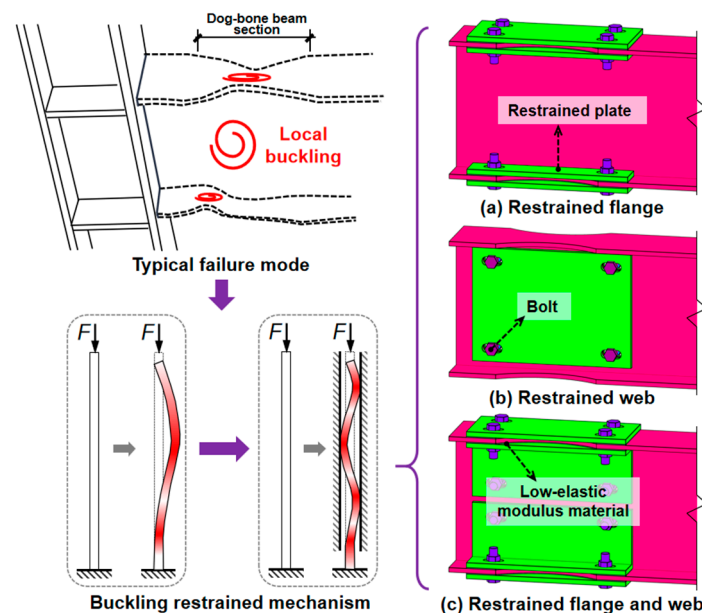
Steel moment connection with a buckling-restrained dog-bone beam section.
